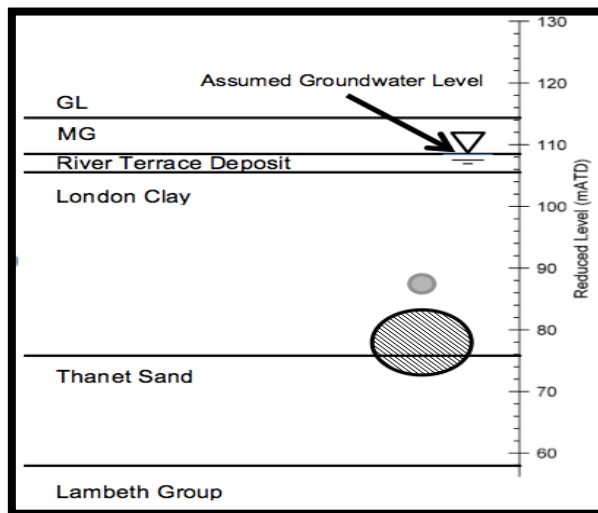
Soil profile surrounding the tunnel and the final location of the new tunnel to be excavated below.
